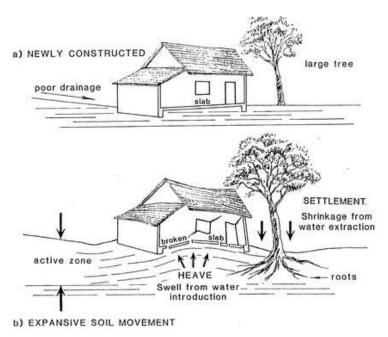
Swelling of soil under a house. Source: Revised expansive soils study (American Geotechnical foundation, no date)
